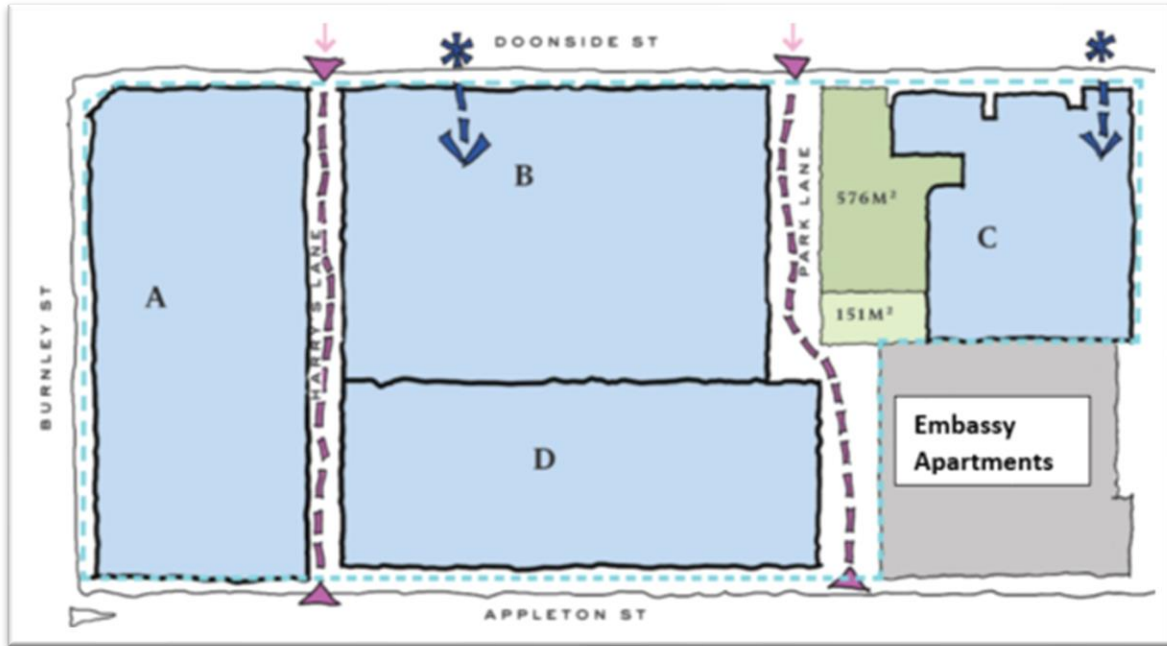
Proposed Master Plan. Source: Development Plan (Gurner 2023)
